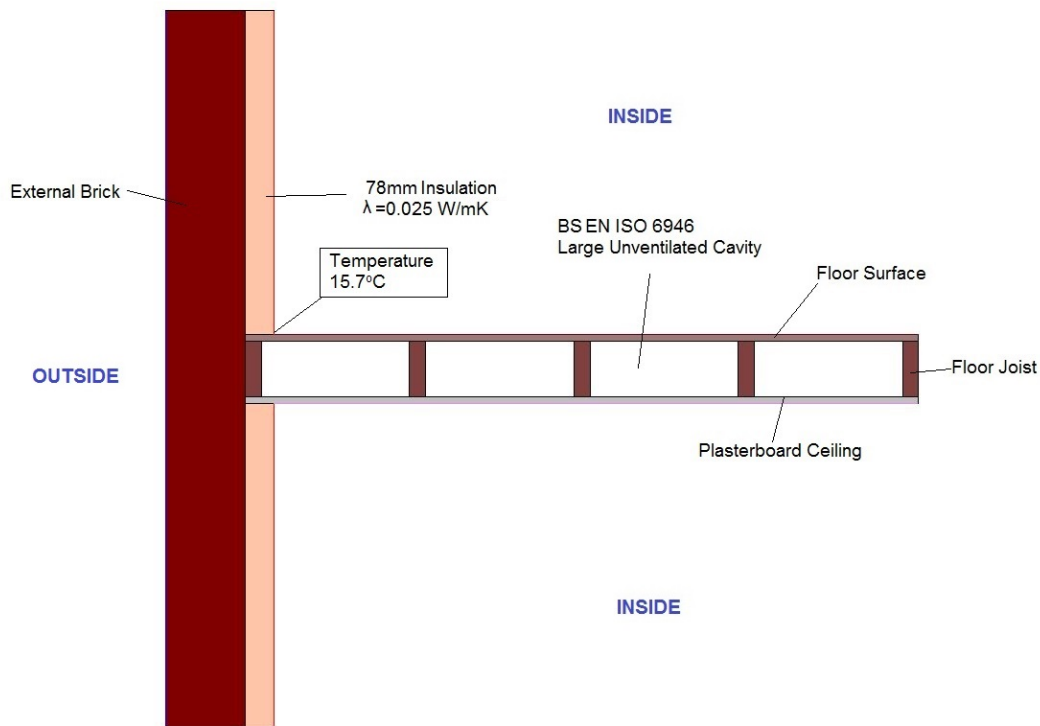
Junction between an upper uninsulated floor and a solid wall (typology R8) with no junction insulation
